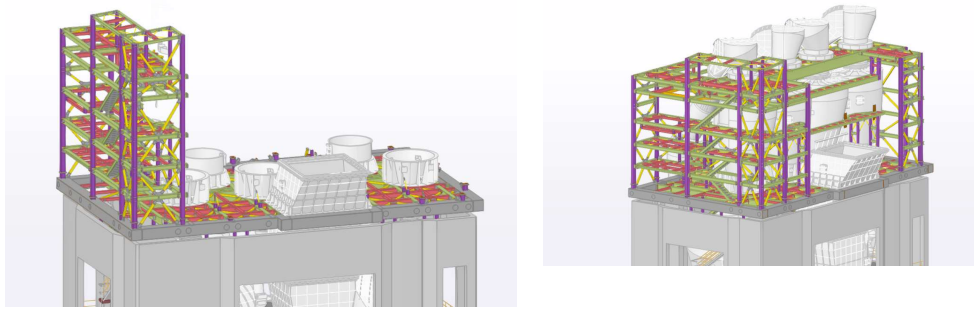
Erection of large lift units equipment (left), completion of erection (right).
